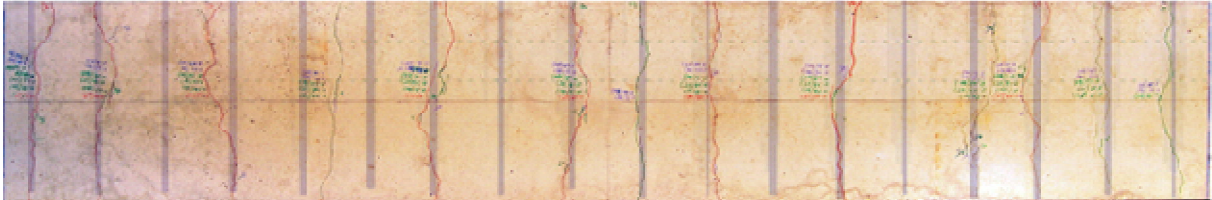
Final crack pattern overlapped with TR layout of specimens with TR-spacing of 300 mm
